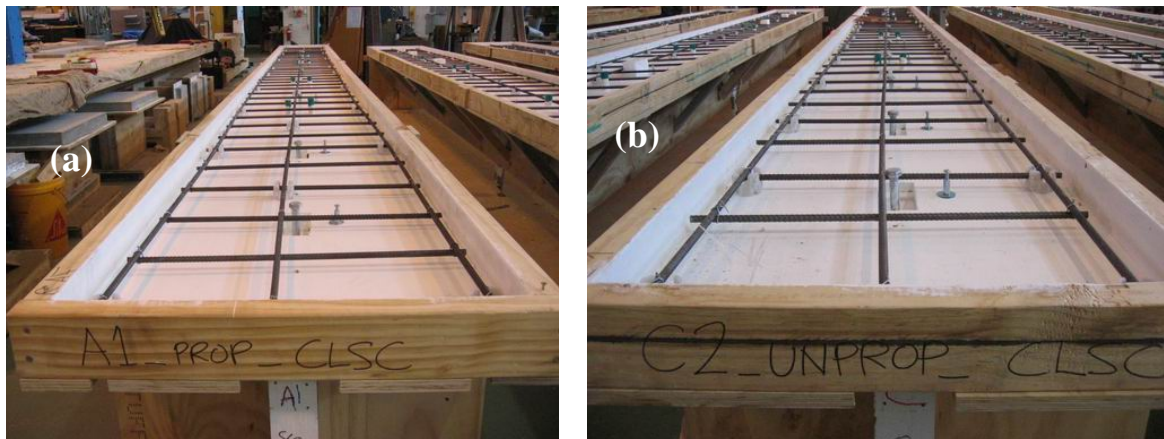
Close up of beams that were ready for concreting: (a) beam A1; (b) beam C2
